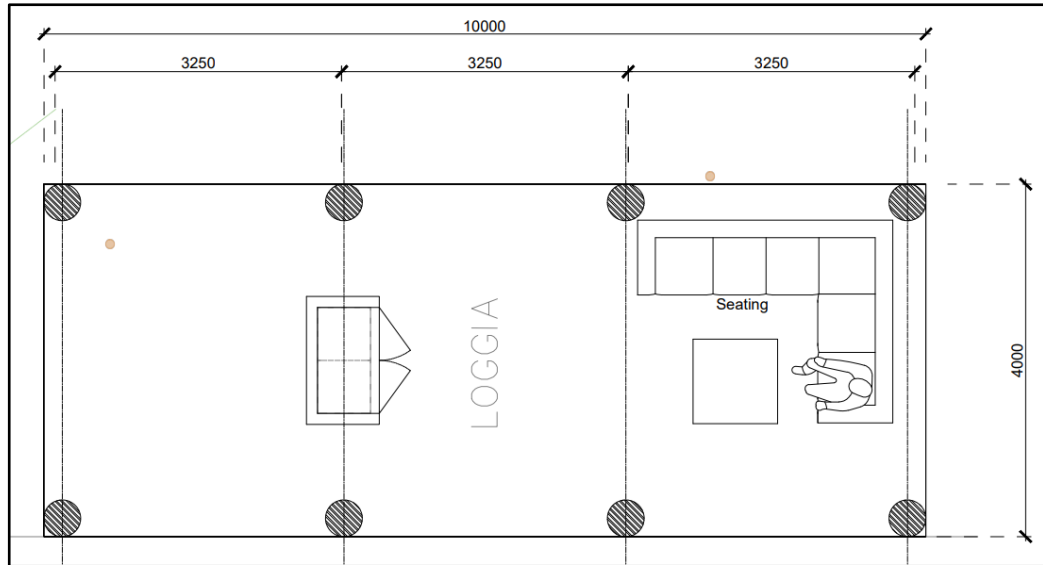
PROPOSED TENNIS LOGGIA FLOORPLAN (CLAGUE ARCHITECTS)
